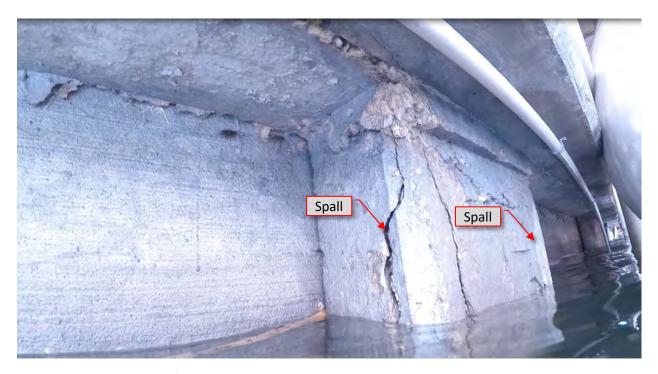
P22. STA 4+20. Break/spall at west and east flanges at pile.
